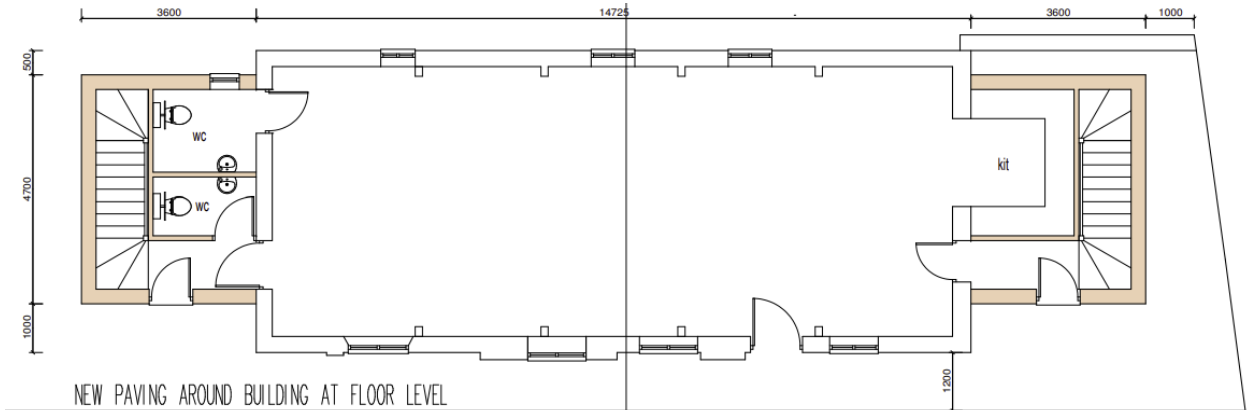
Consented ground floor plan (ref. 23/0625/FUL).
